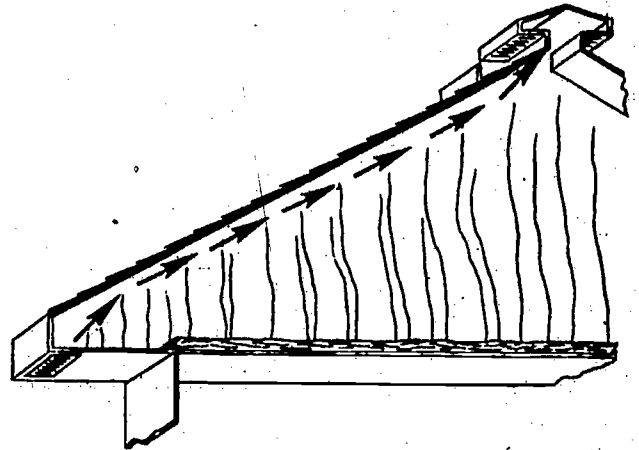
Ridge ventilator provides uniform airflow from soffit to ridge.
